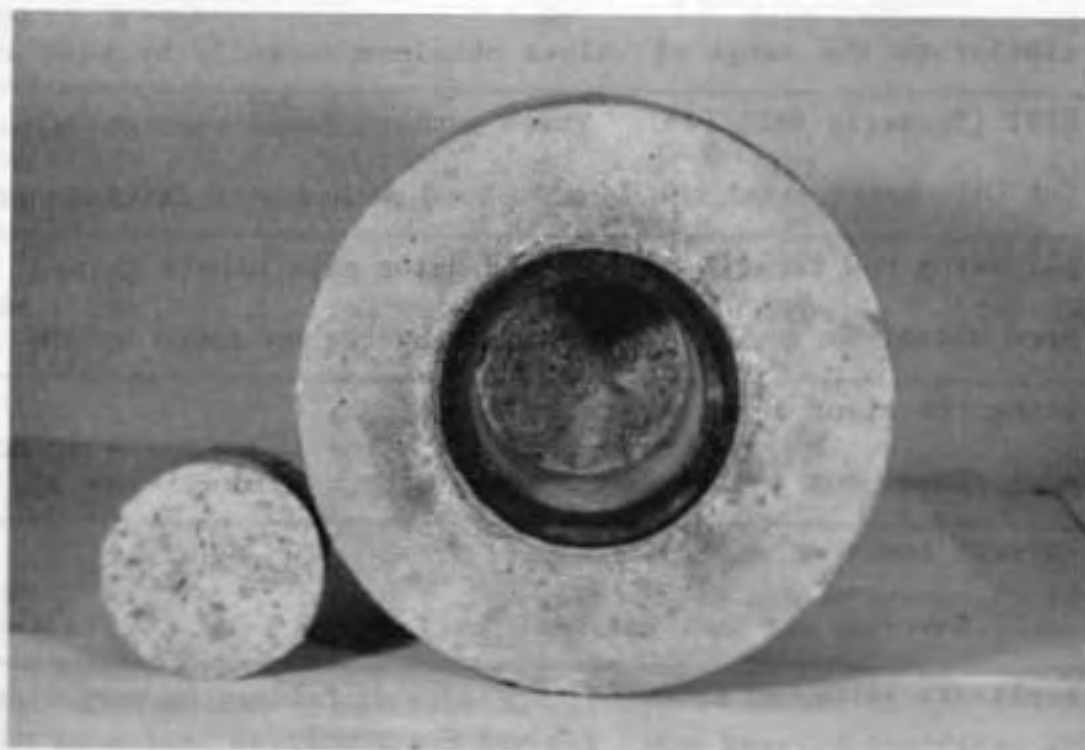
Failure Surface of a Latex Concrete Specimen and Base Concrete Assembly from which It Was Separated
